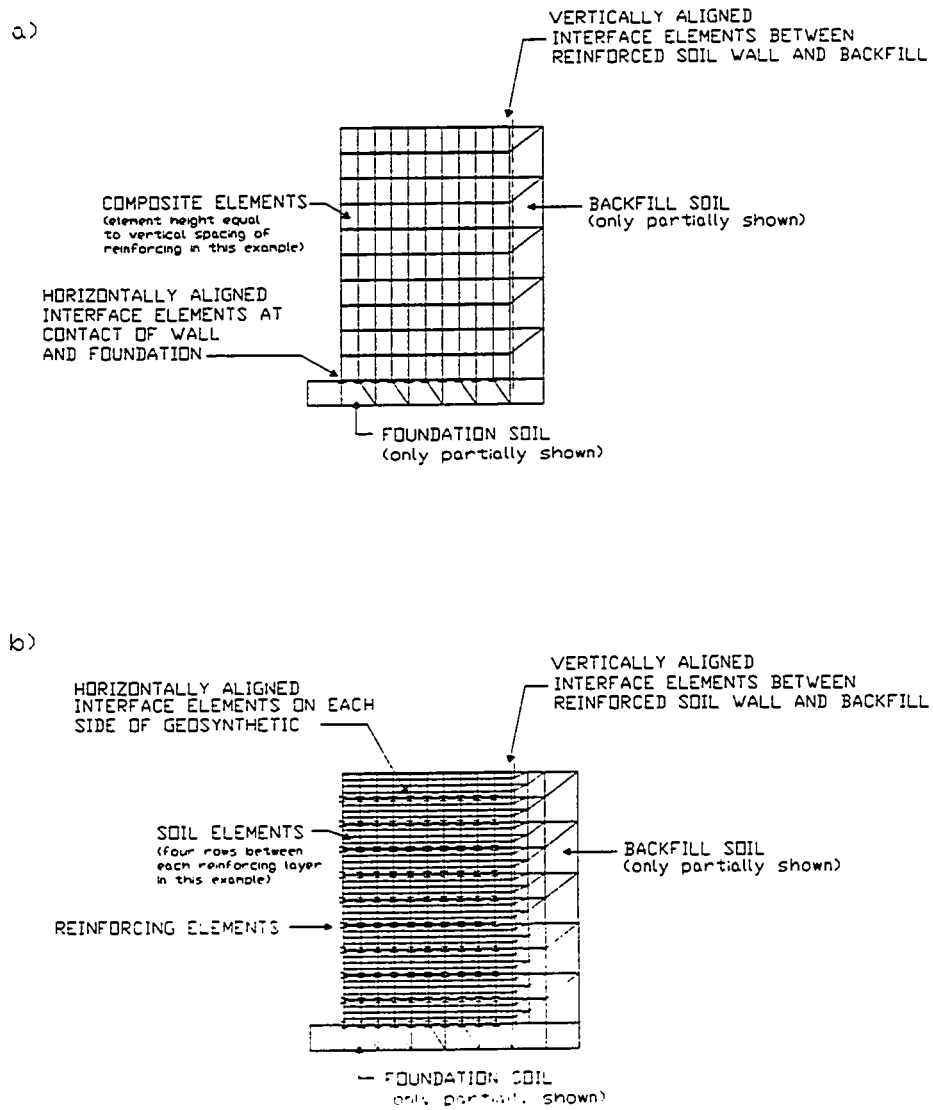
Finite element model of a reinforced soil wall: a) with composite elements, b) with discrete elements.
